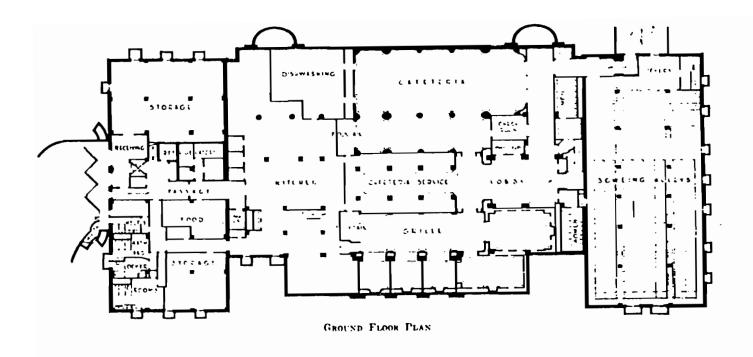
Illini Union basement blueprint before Jim Crow washrooms were constructed in the storage area (upper left-hand corner of blueprint). (See enlarged blueprint, revised in 1948, for the addition of segregated washrooms in Appendix C.) (Source: Ralph Eckerstrom. <u>Ten Years</u>. Published booklet. Urbana: University of Illinois Press, 1951.)
